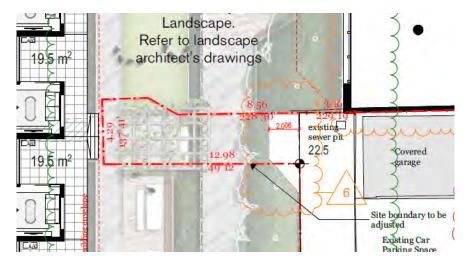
Proposed ground floor plan showing location of works within CL1091
